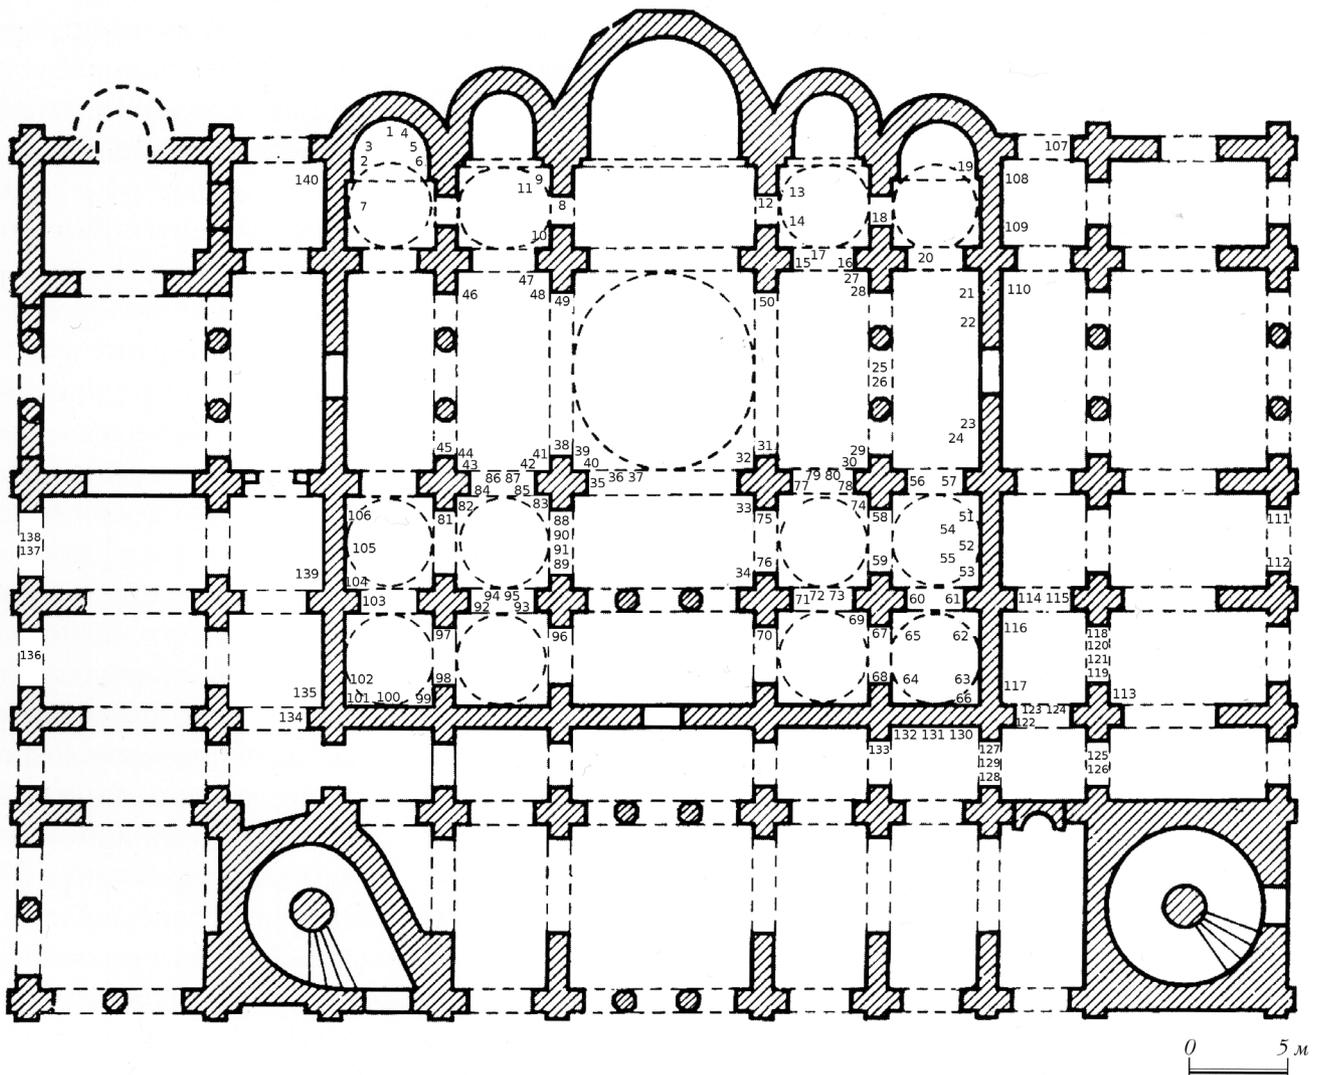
Kiev, St. Sophia. Plan of the ground floor (reconstruction).
